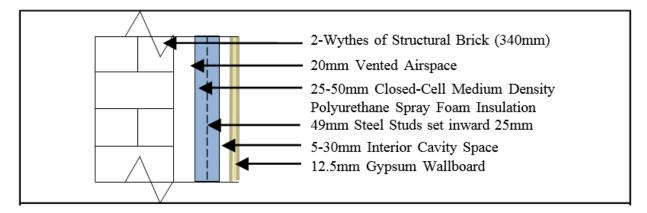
Vented Masonry Retrofit approach (Tzekova, Pressnail, Binkley, & Pearson, 2011)
